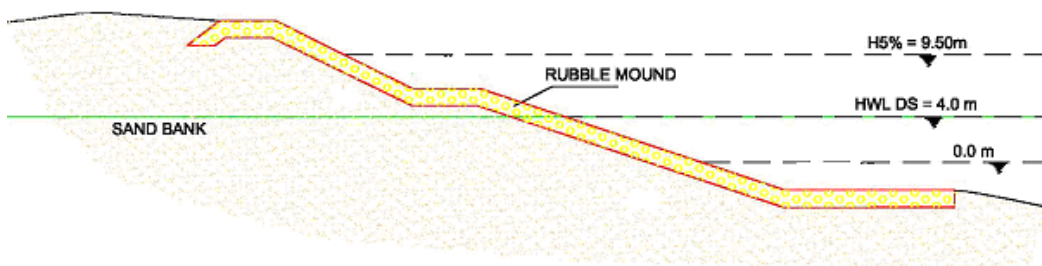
(3) Conceptual Cross-sectional View of Training Wall
